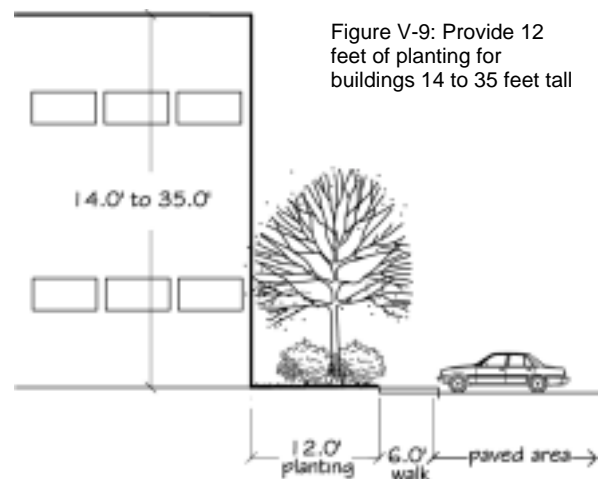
Provide 12 feet of planting for buildings 14 to 35 feet tall
